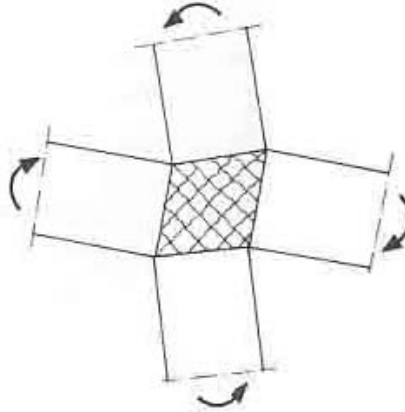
Shear failure due to premature yielding of the joint reinforcement
